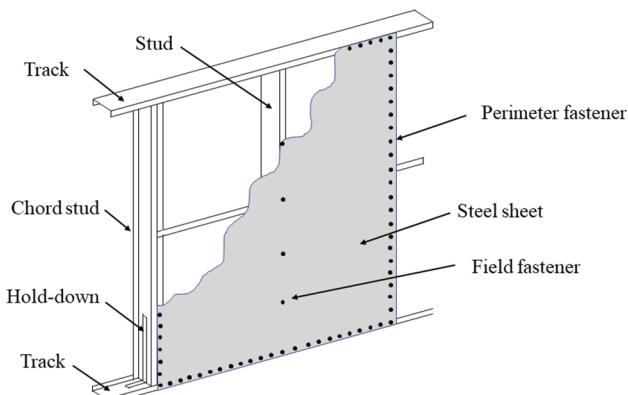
CFS framed shear wall with steel sheet sheathing.
